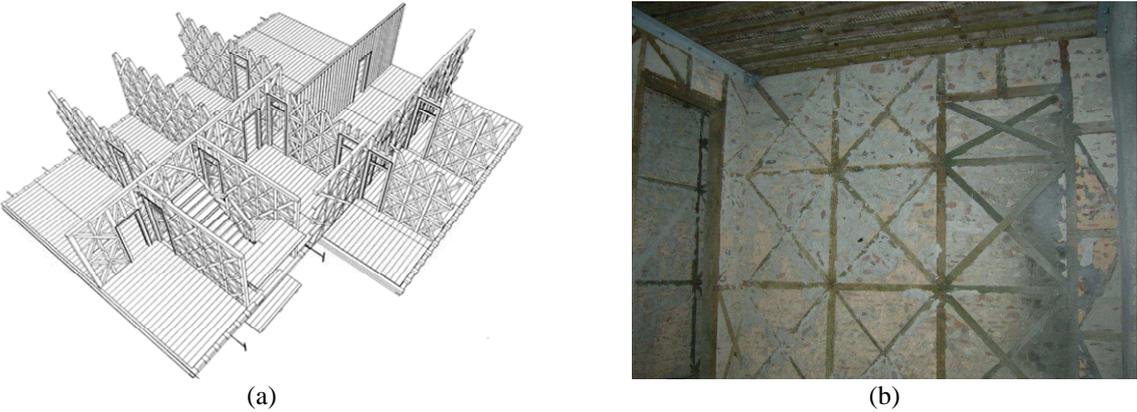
Examples of gaiola pombalina: (a) general floor plan (Coias 2007); (b) detail of half-timbered wall (<http://eventos.fct.unl.pt/cirea2012/> 2012)
